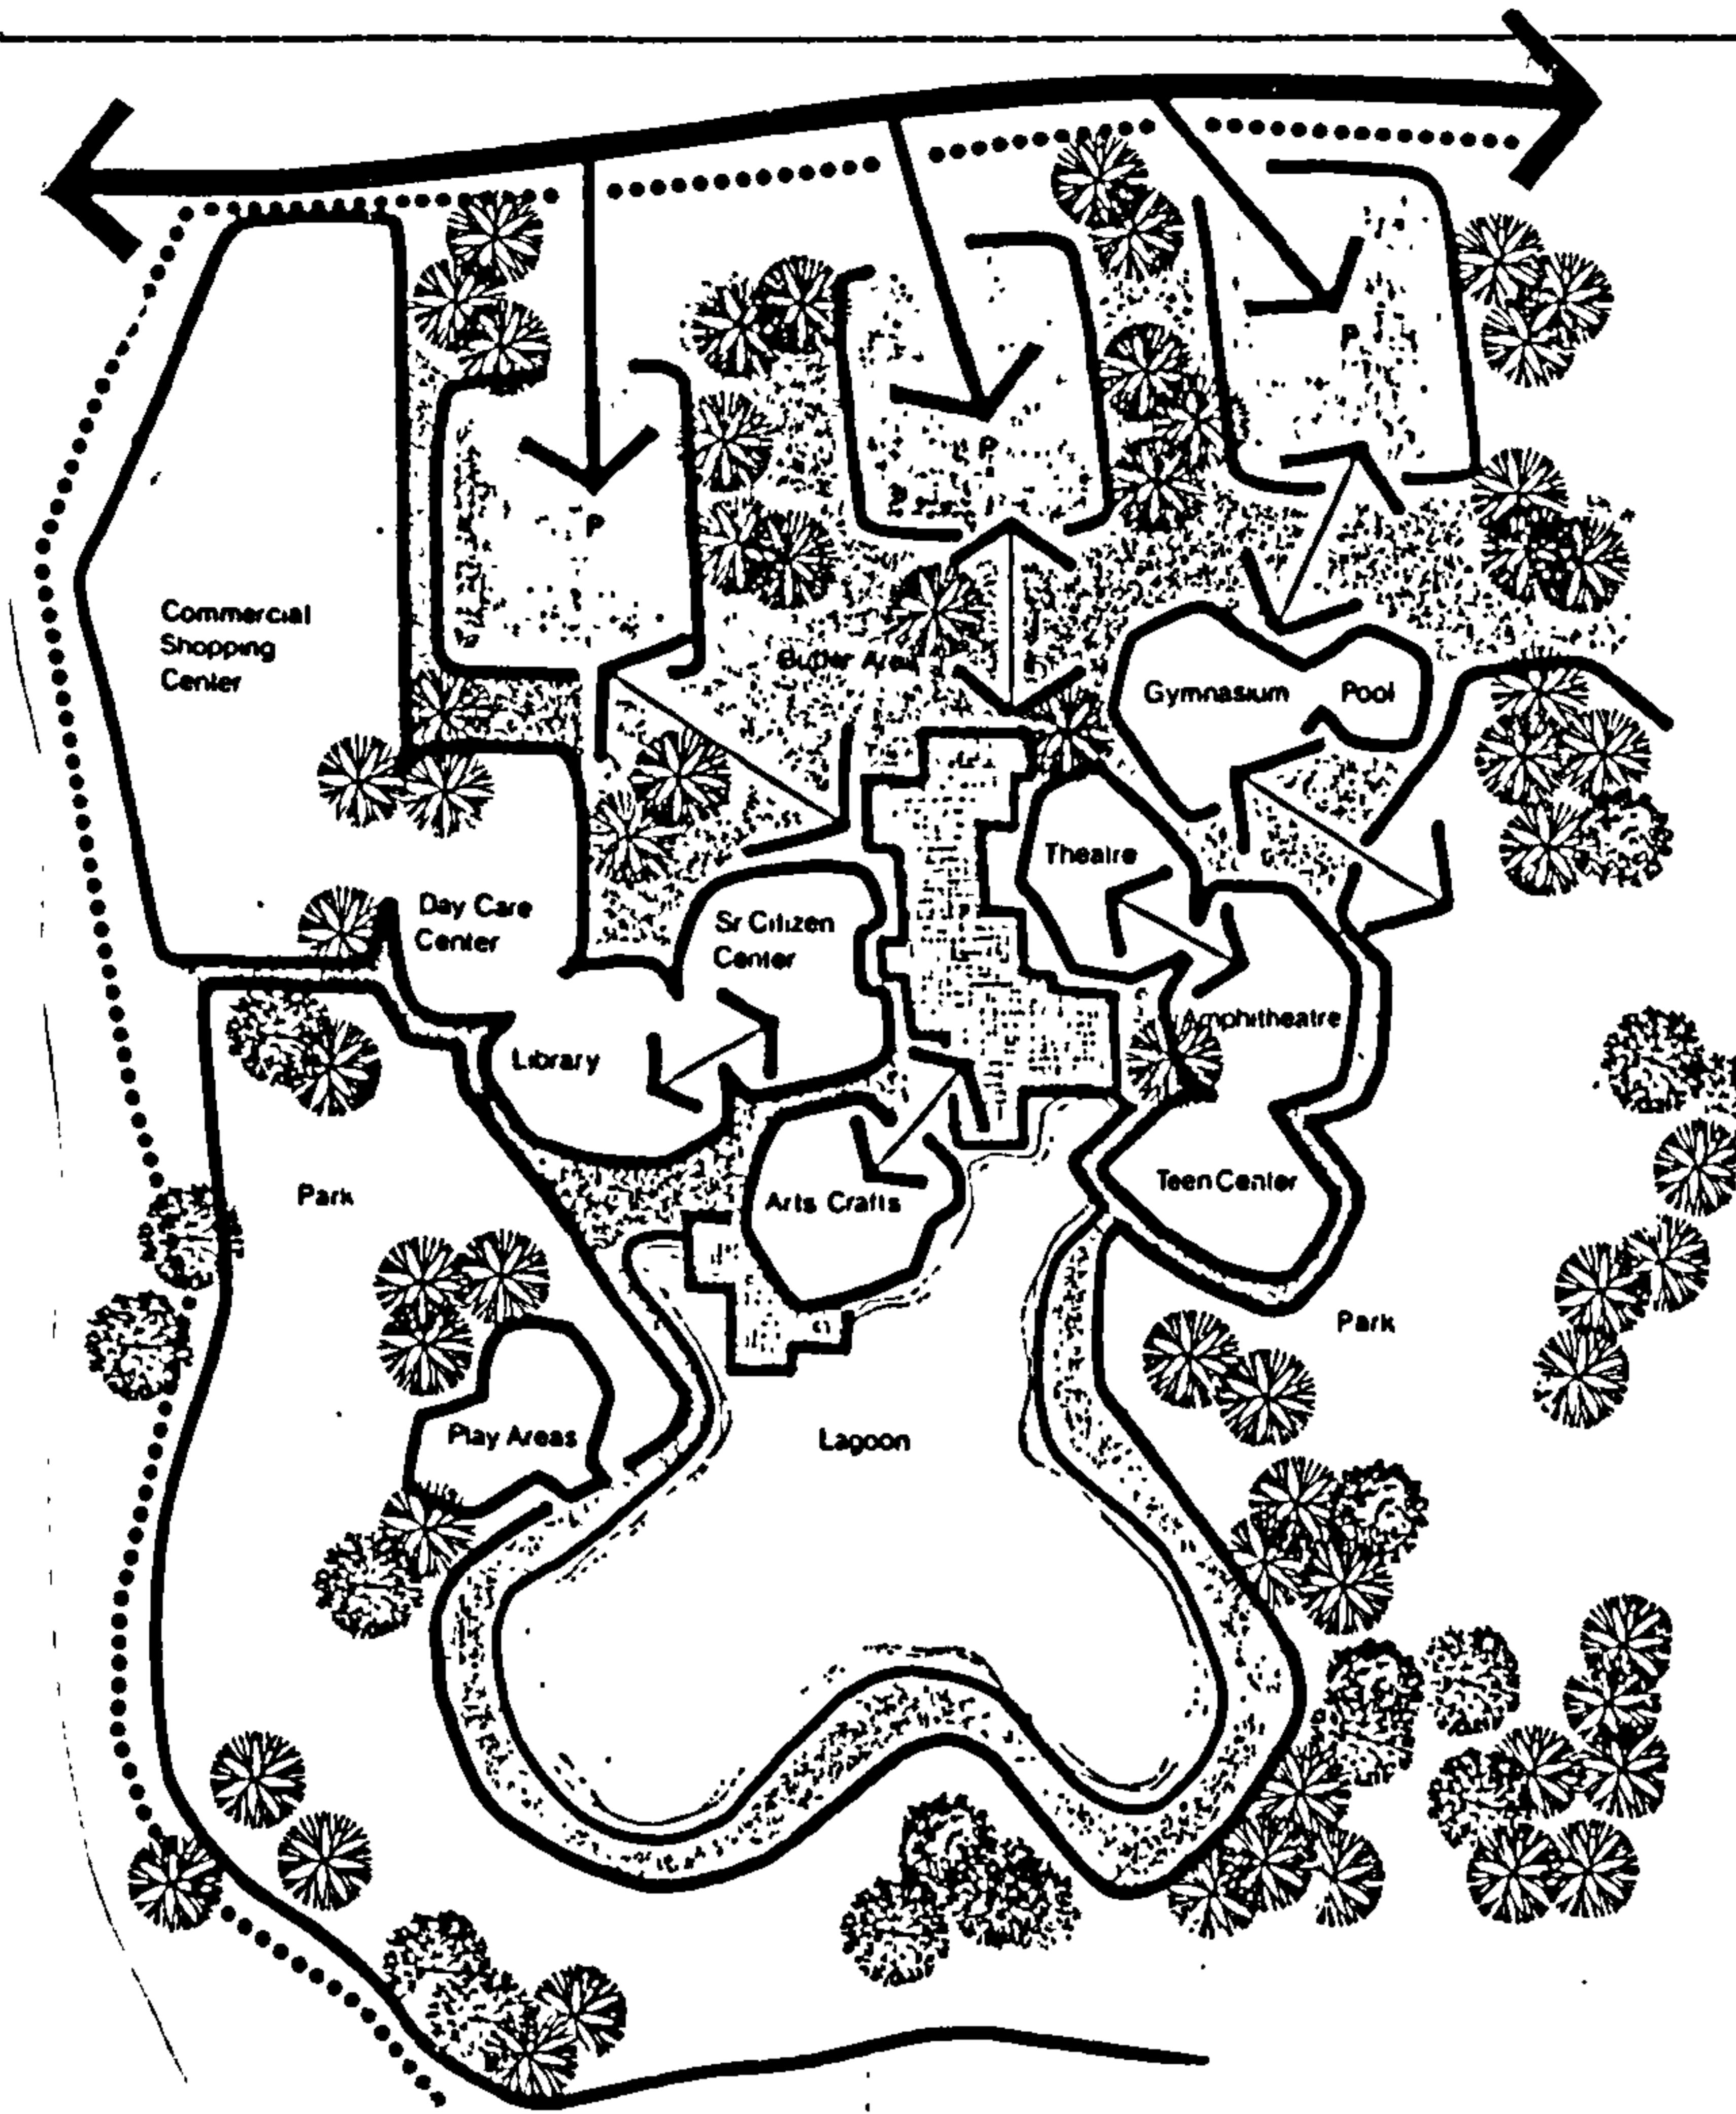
Site plan of some outdoor recreational sites in California.⁹³
